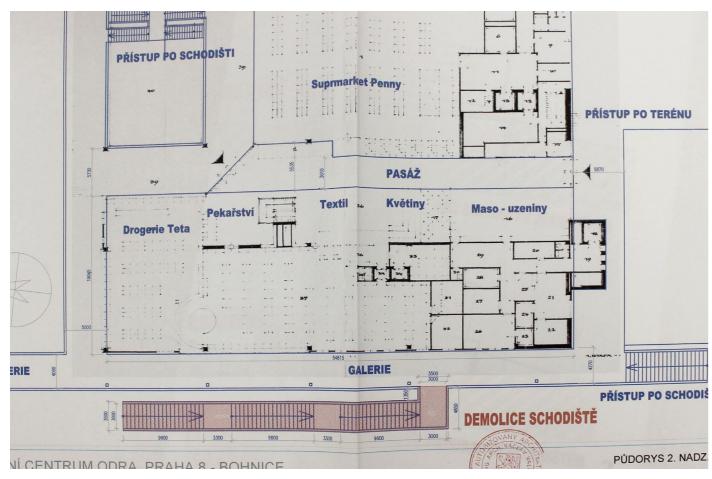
Plan of proposed demolition of outside staircase, 2015  $^{\circ}$  Building Authority of Prague 8 - Archives, 401 -5/5 objekt B
